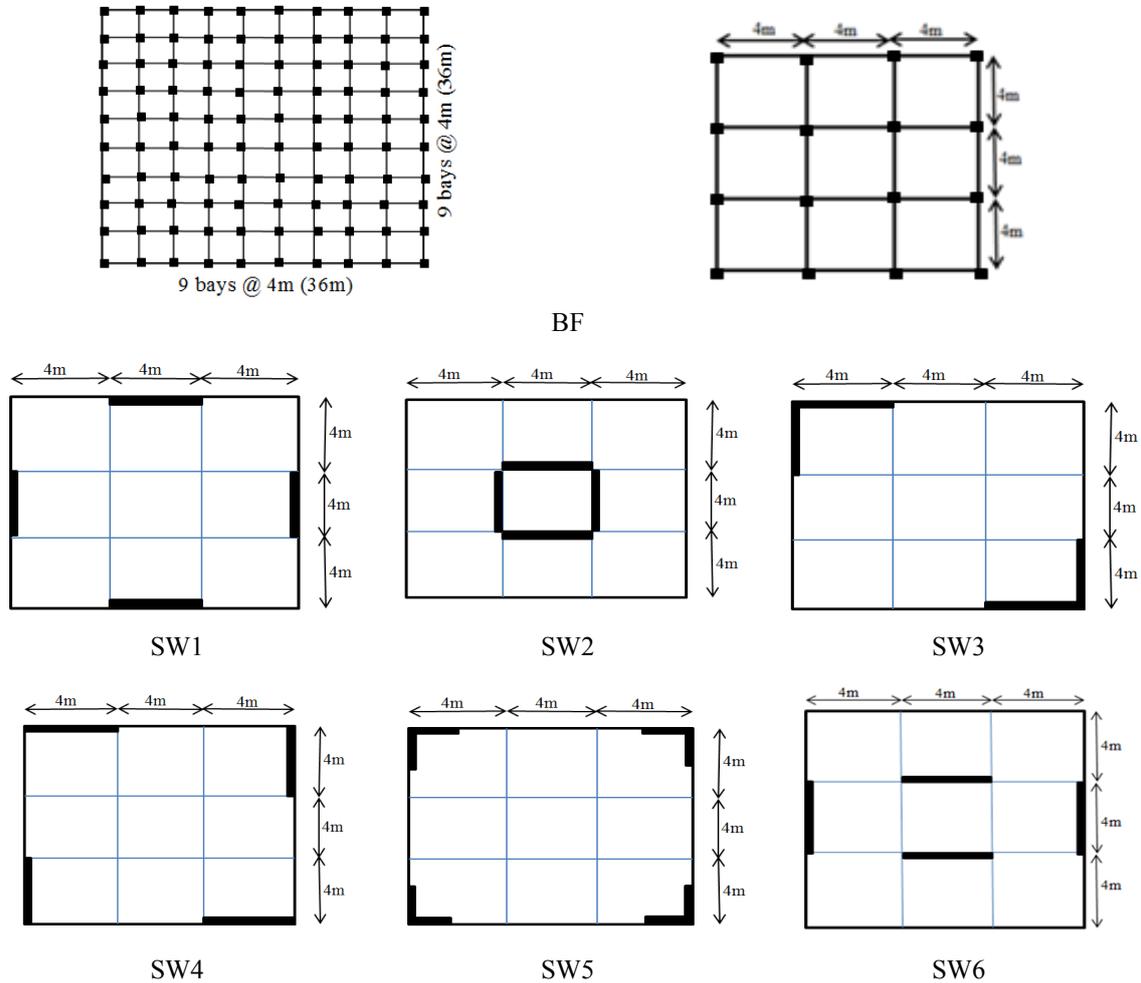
Plan of bare frame wide and narrow and frame with various locations of shear wall
